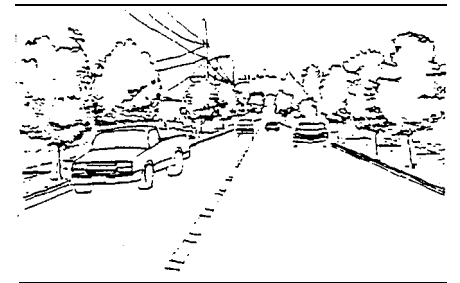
32nd Avenue S. With New Curbs, Gutters, Planting Strips, and Street Trees
